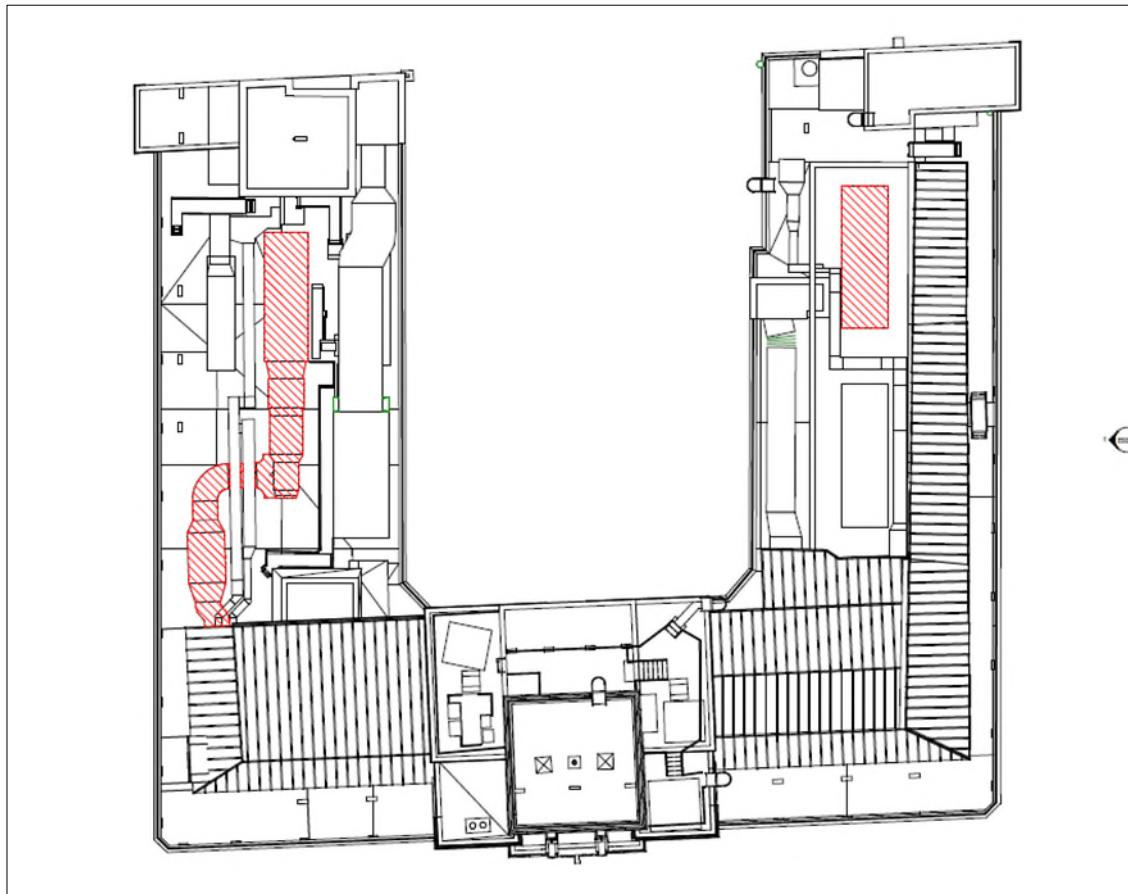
9th Floor Plan Showing Locations of Existing Plant
